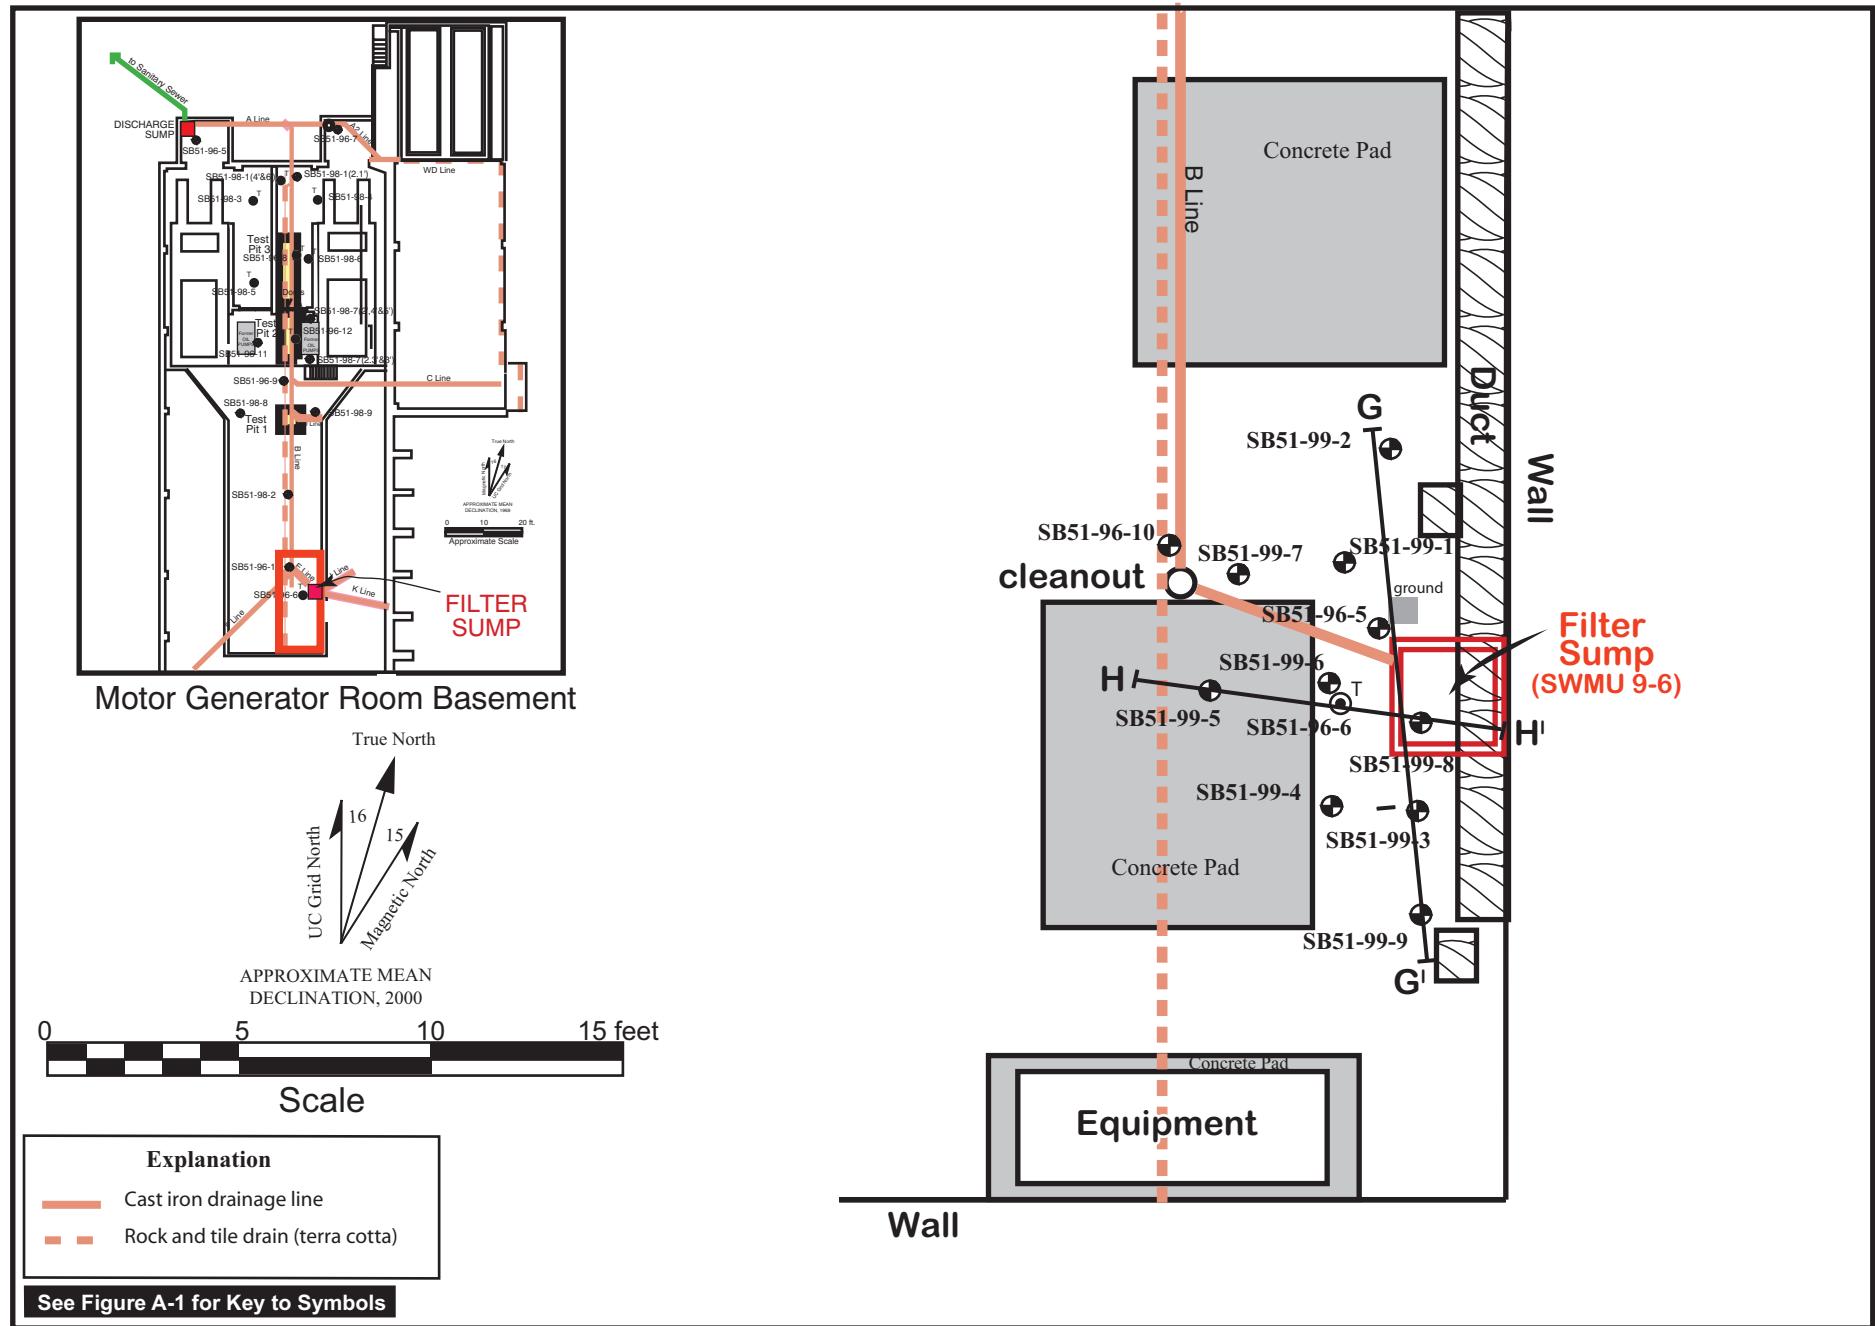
Locations of Soil Borings and Cross Sections, Building 51, Motor Generator Room Basement Filter Sump.
